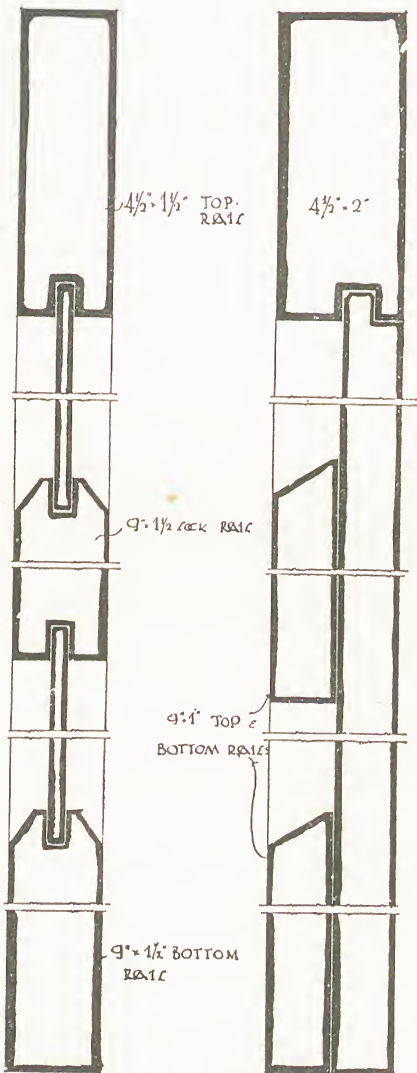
Vertical sections of a panelled, and a ledged, braced, and framed door.
